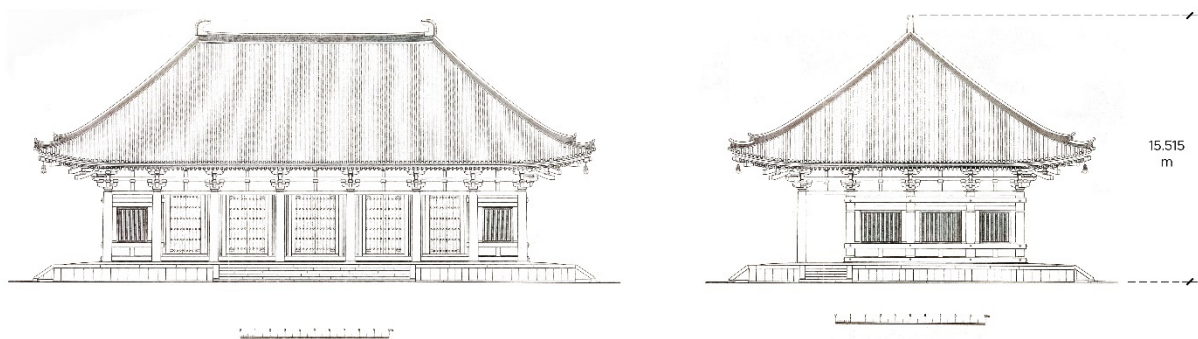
South Elevation and East Elevation (Office of Cultural Assets Preservation, 2009)
